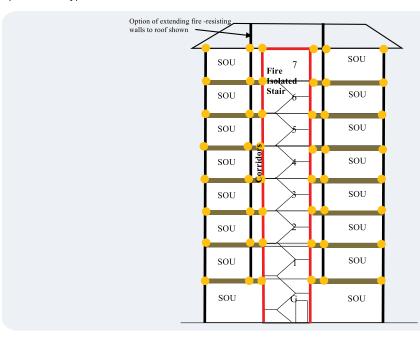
Vertical section of an apartment building showing typical cavity barrier positions.
